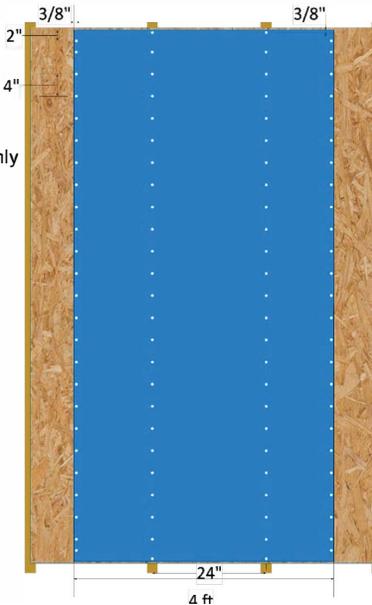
, Fastening Configuration for 24" O.C. Wood Frame: Hybrid - Direct to Stud and Off-Stud Nailing Application
